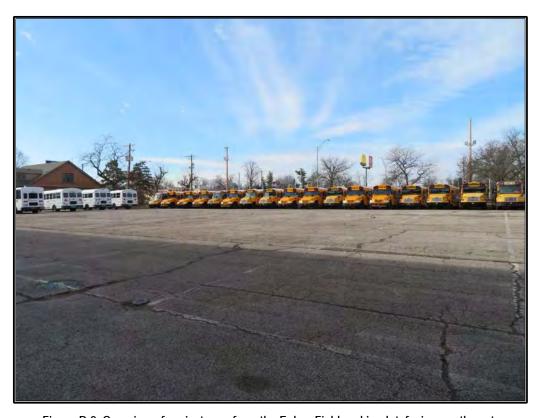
Overview of project area from the Enlow Field parking lot, facing southwest.
